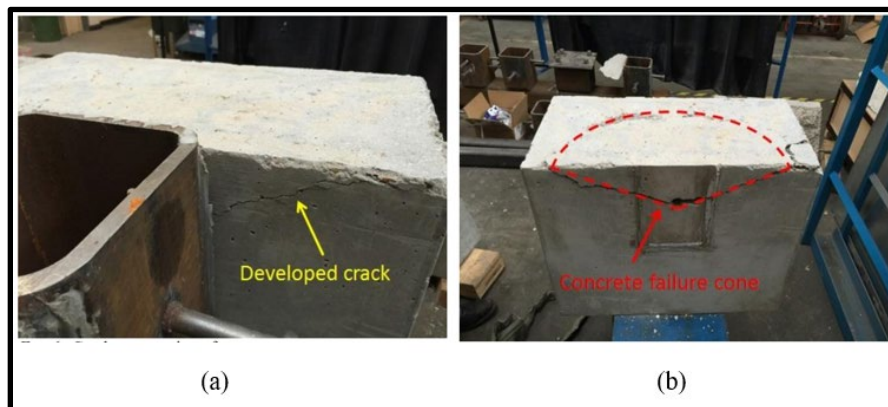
(a) Crack propagation of concrete; (b) Failure pattern of concrete [11]
